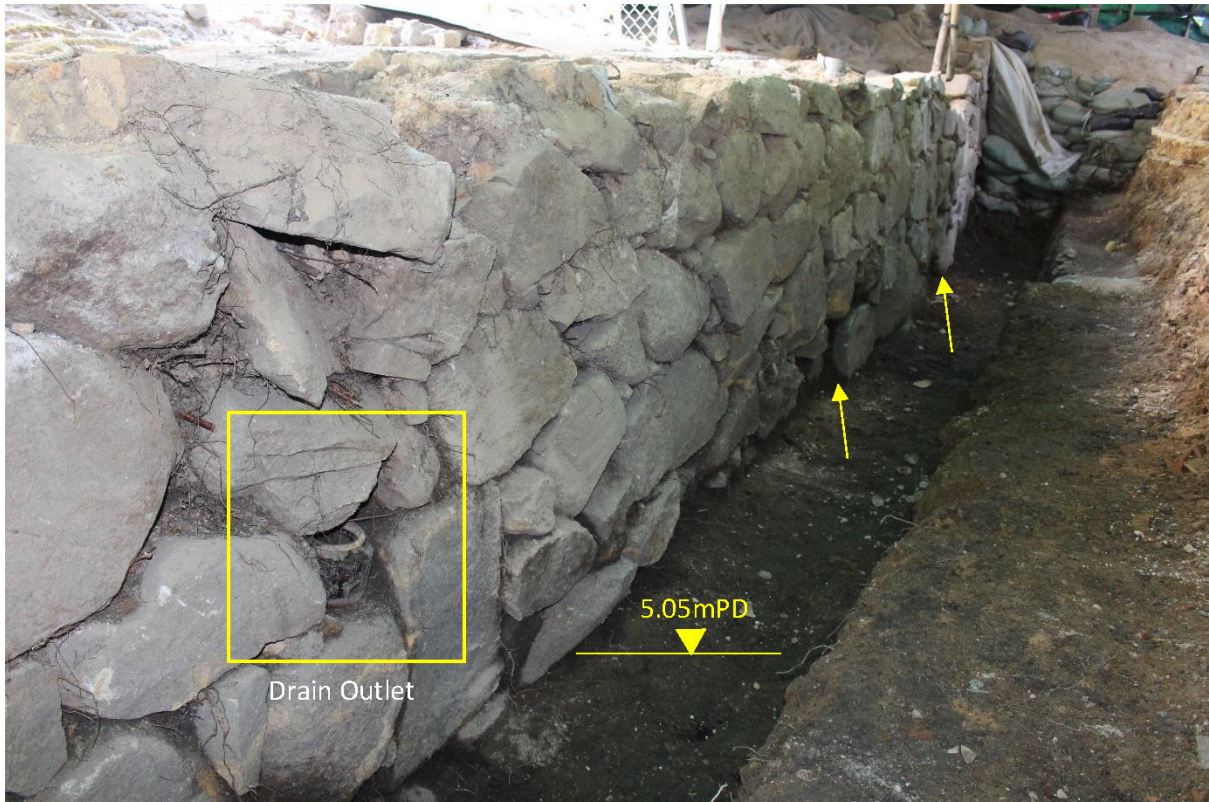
View of stone drain outlet at Lane 2, looking northeast. Note the apparent sections in the wall. There were no special artefacts or village wall features recorded in Area SC.
